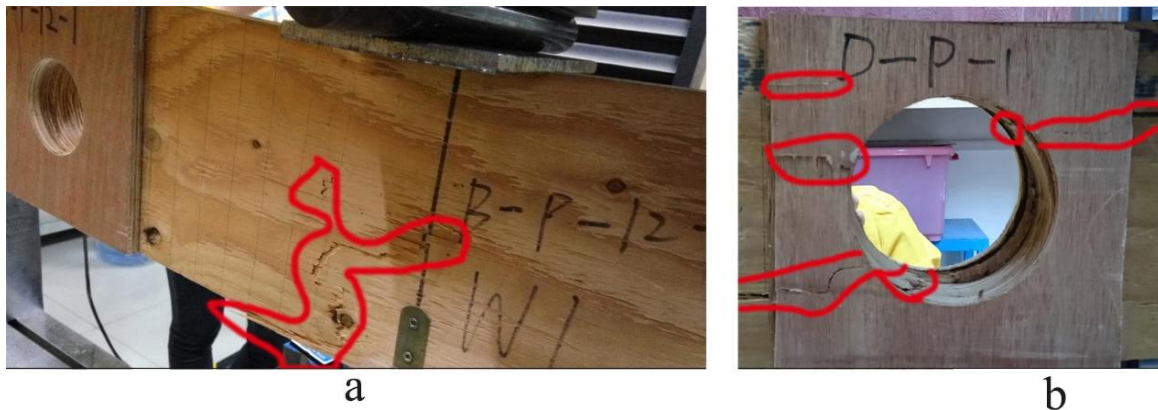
Failure observation: (a) bending failure in mid-span of joists reinforced with 12-mm plywood and (b) shear failure cracks in 9-mm plywood
